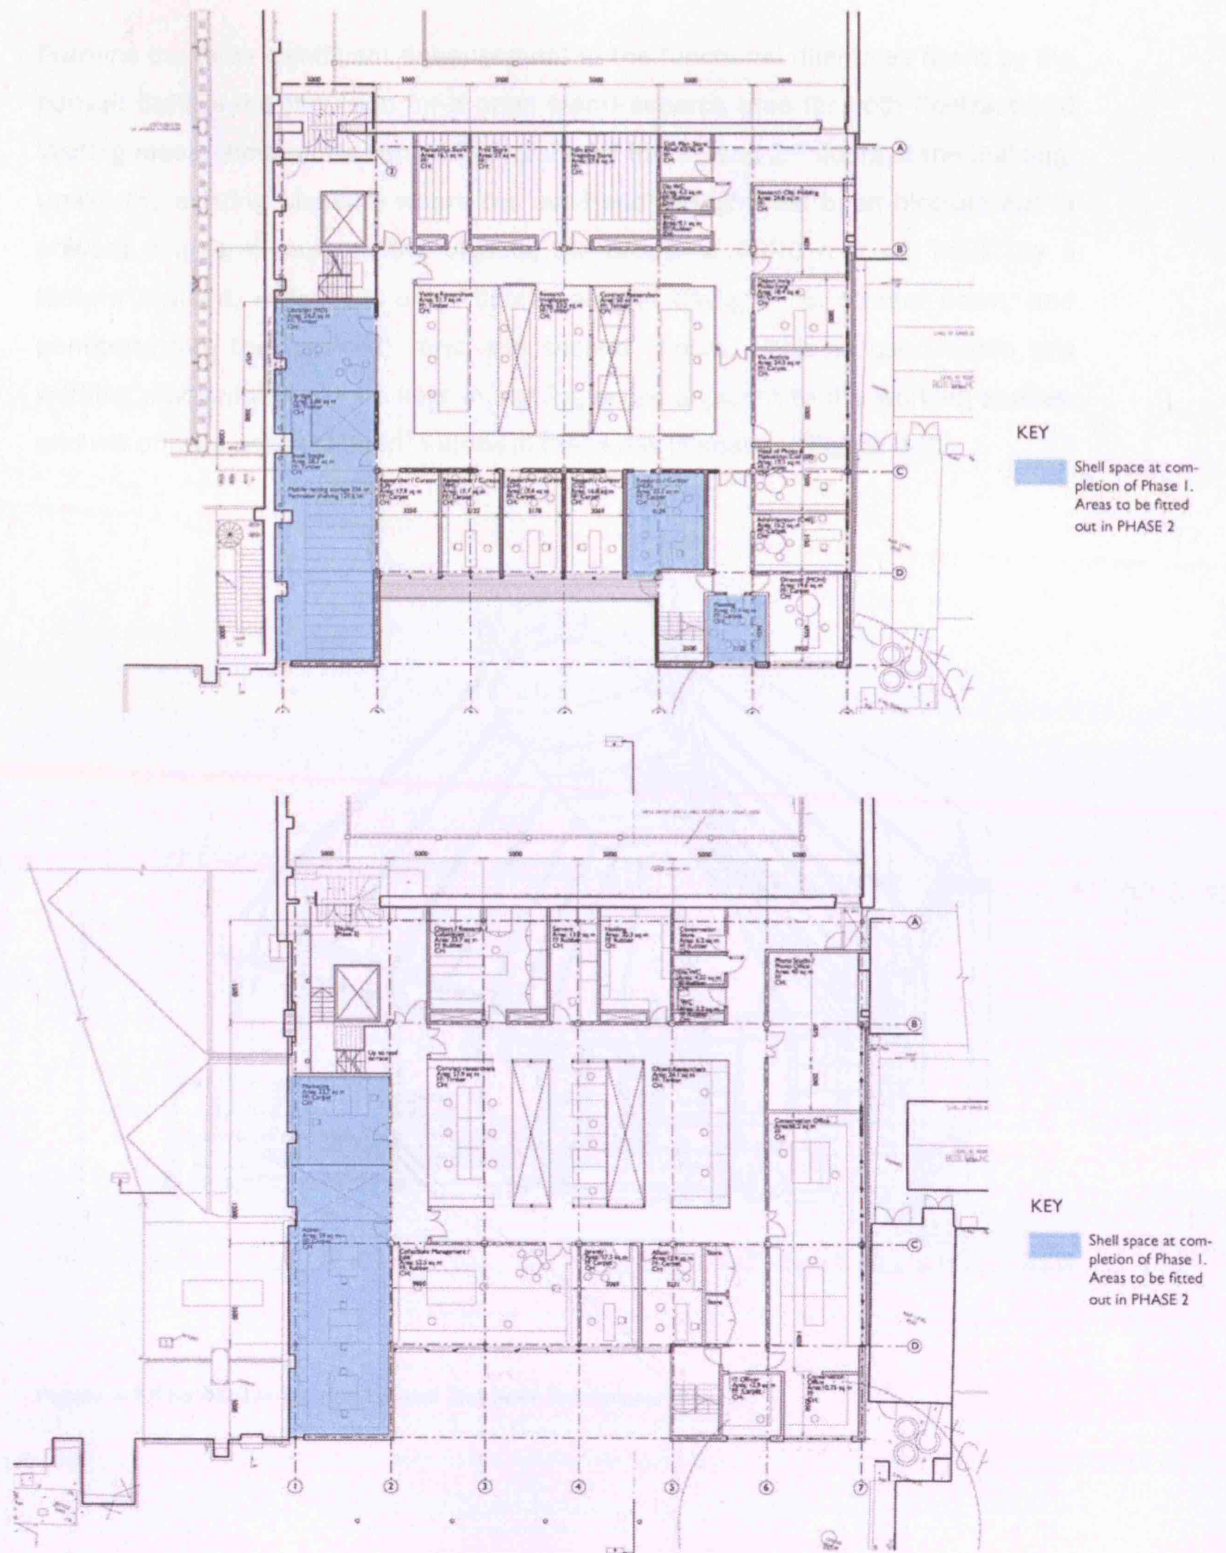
First Floor Plan (above) and Second Floor Plan (below)
